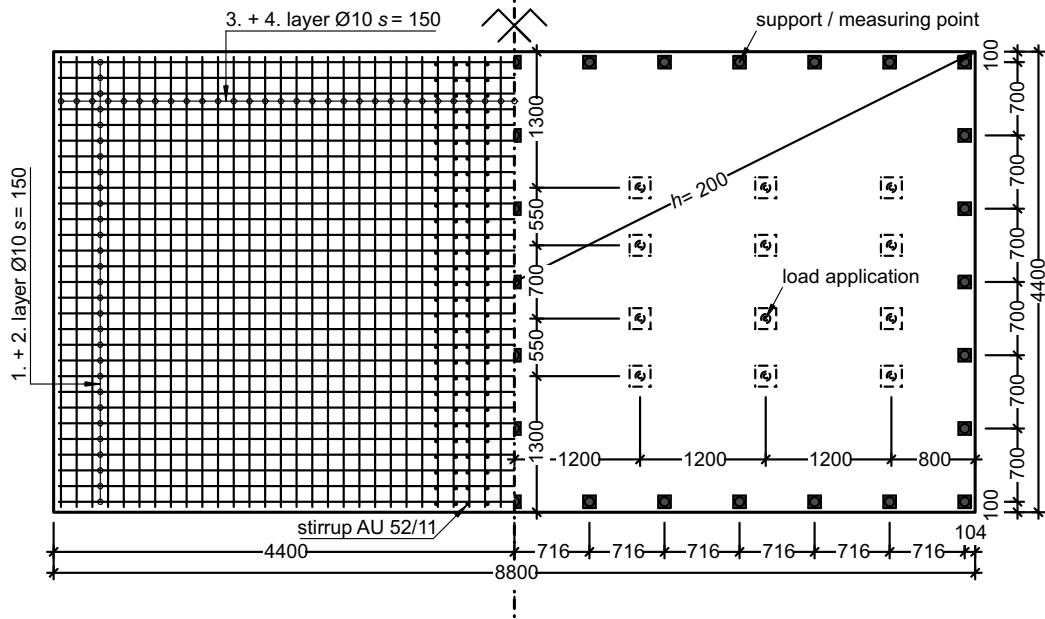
Test plate: geometry and reinforcement detailing (distances in mm)
